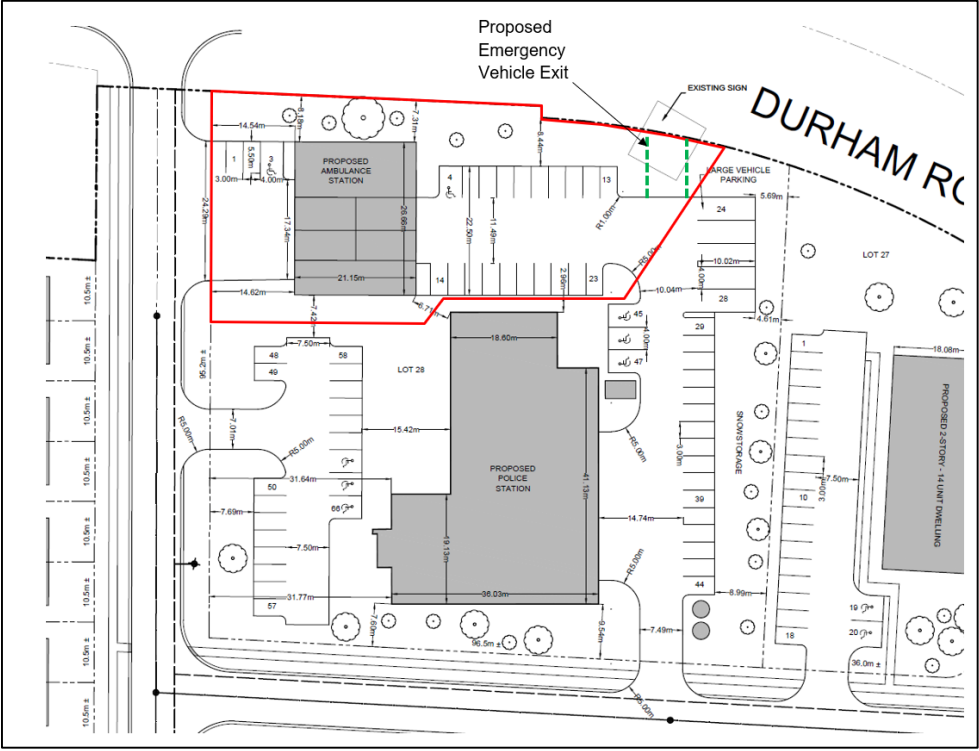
Concept Plan of New Paramedic Base and Proposed Lands to be Acquired
